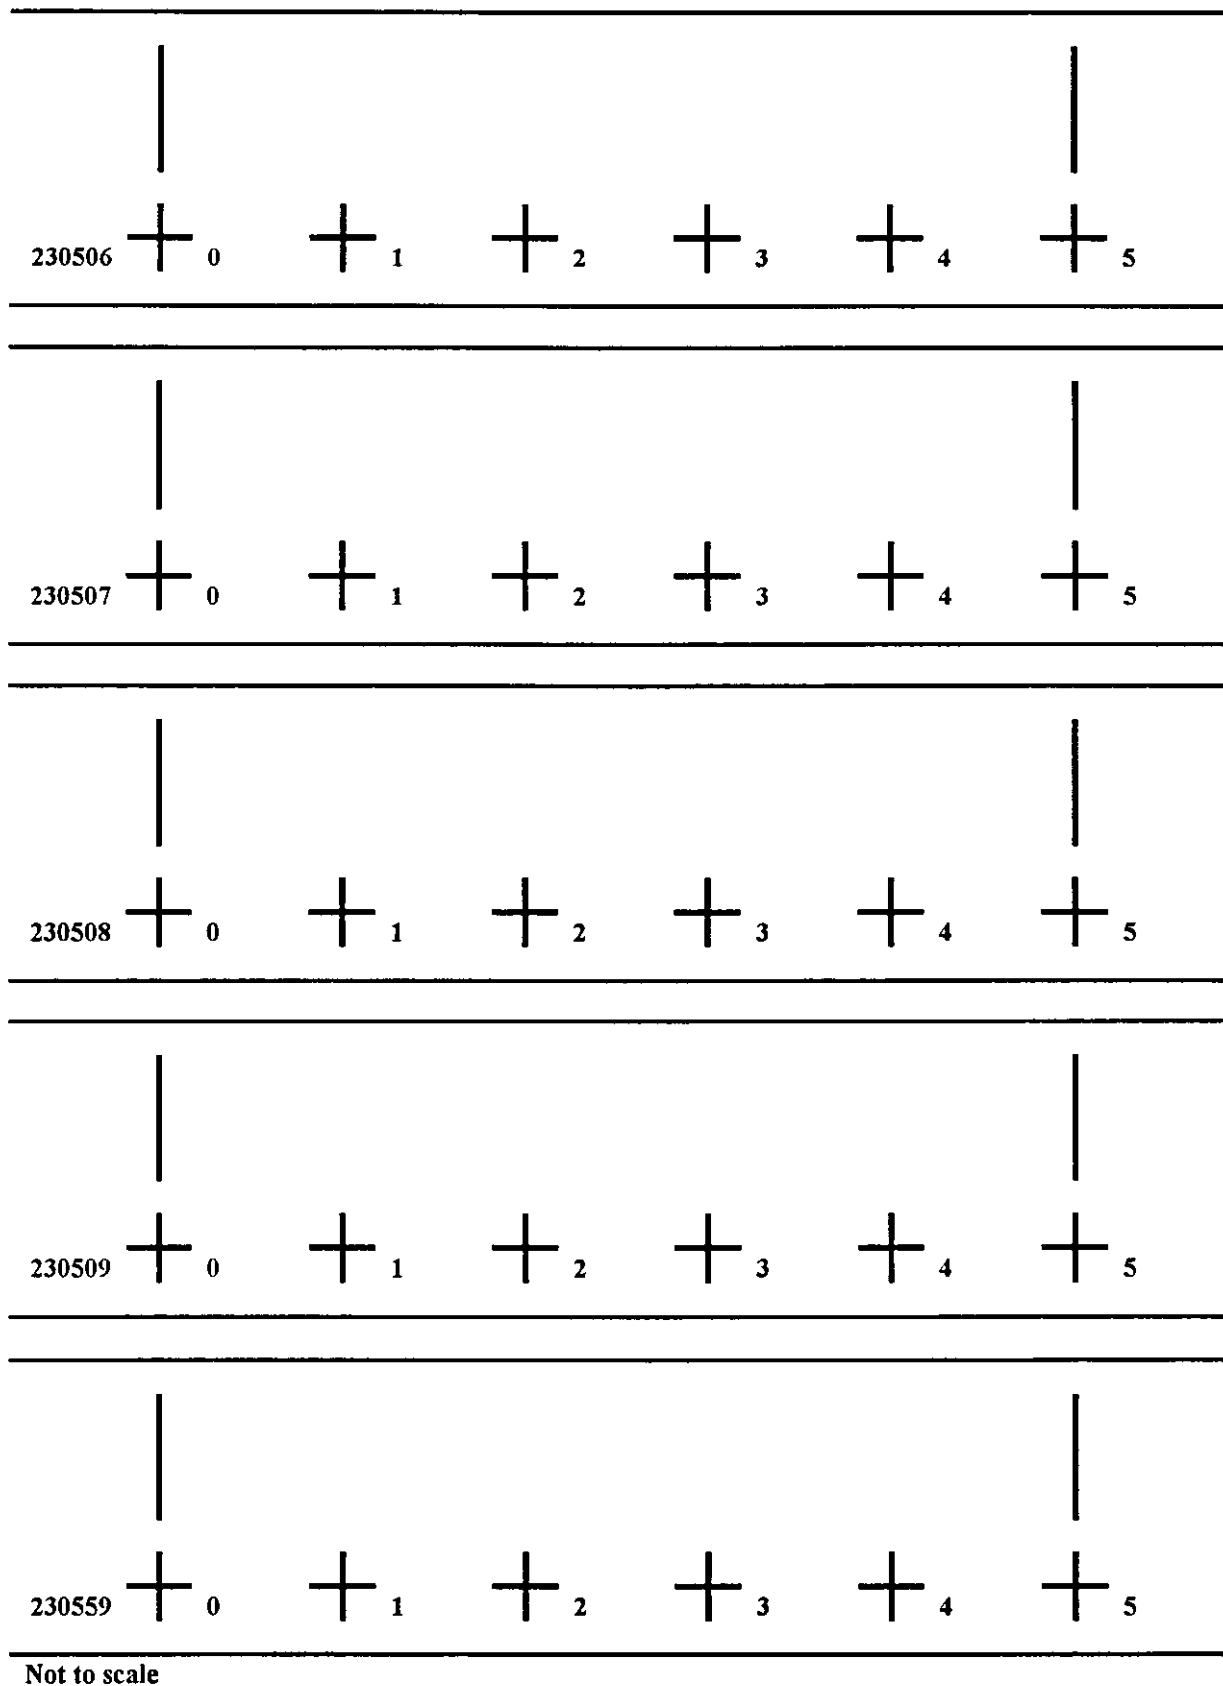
(Cont.). Site Marking Plan, Before and After Construction
